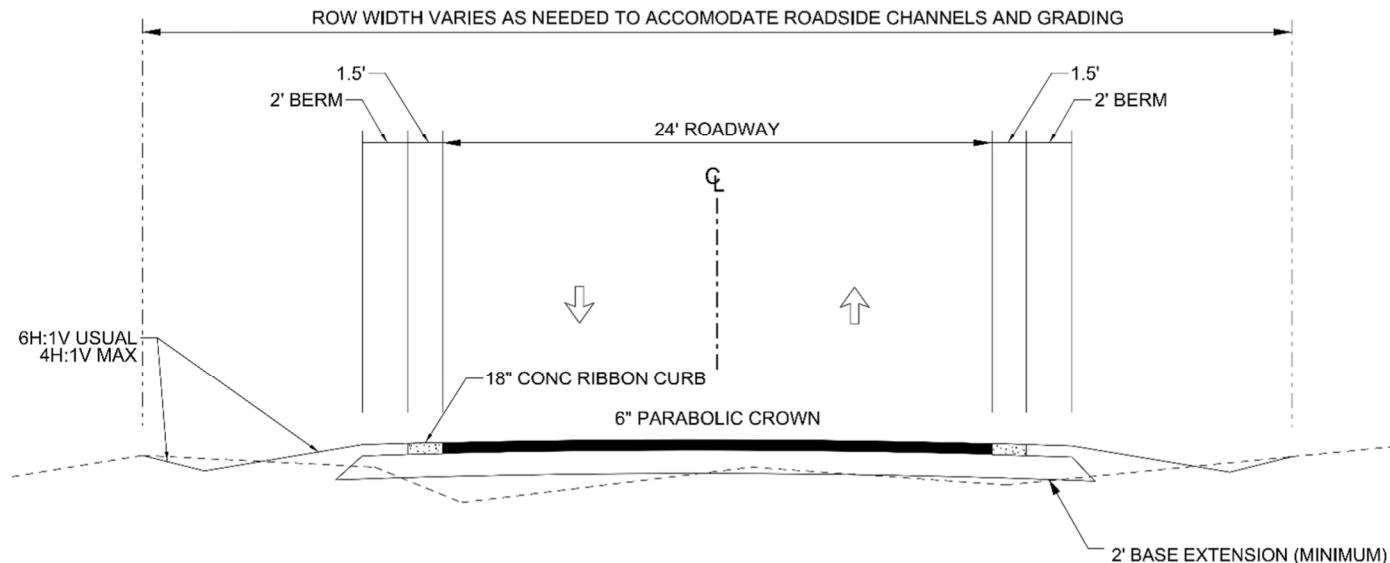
(a) RURAL STREET TYPICAL SECTION
